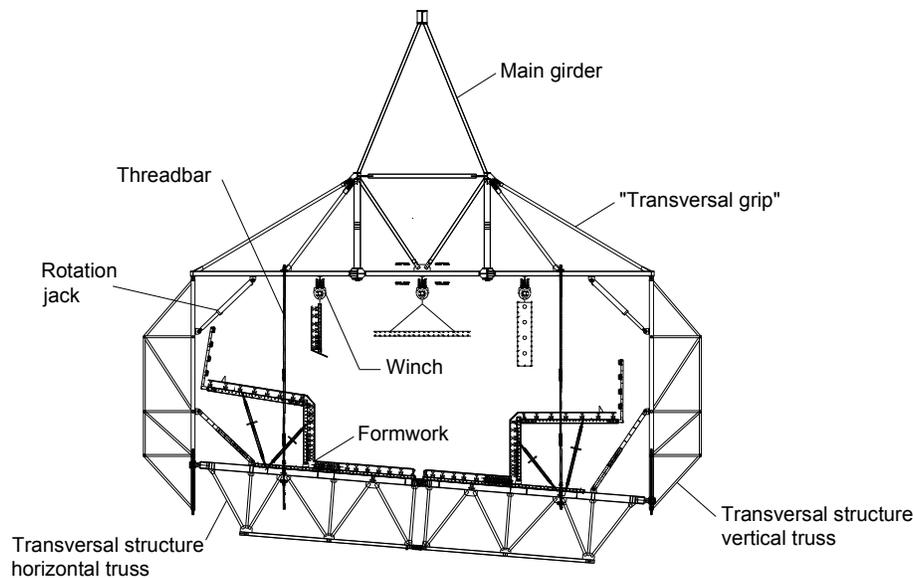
Single span construction movable scaffolding system in concrete pouring position (mid-span cross section)
